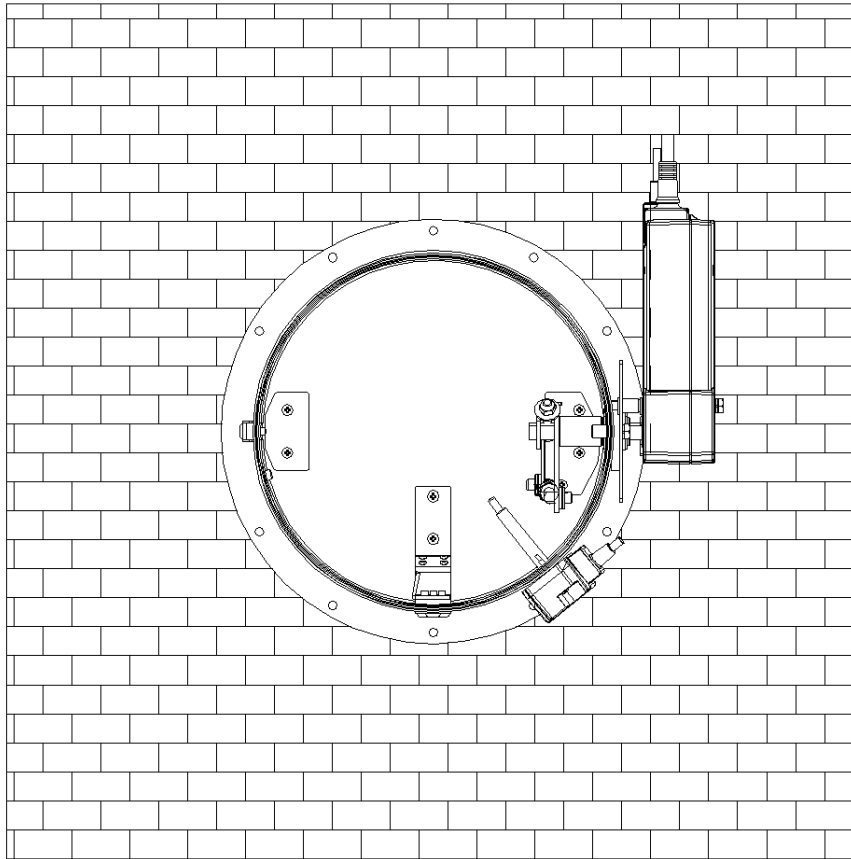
Installation of KTS-O in rigid wall construction with horizontal axis of rotation of the damper.
